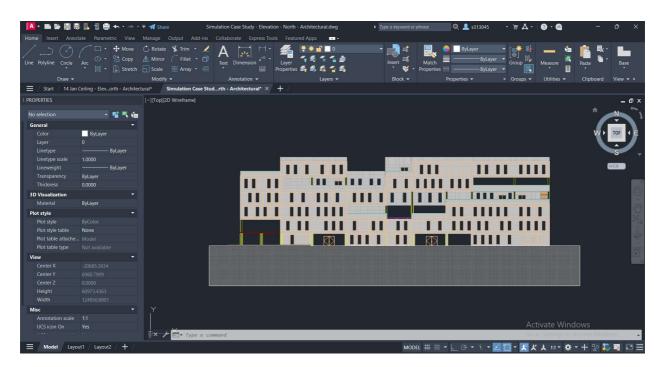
North Elevation in AutoCAD after editing, Elaborated by Authors
